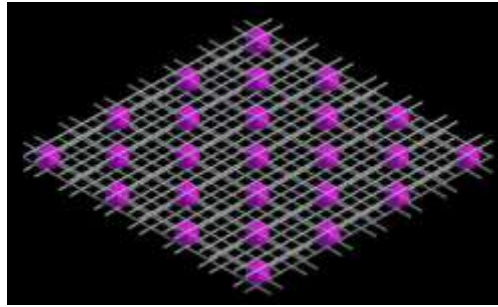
3-D view of ball and reinforcement of alternative slab.
